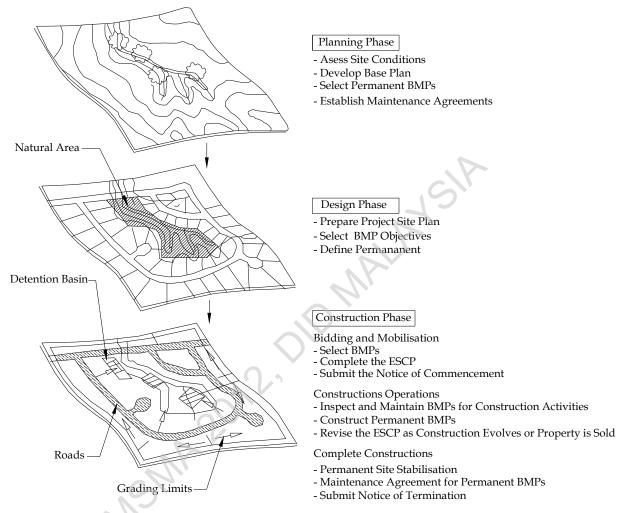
Plan Preparation Stages for ESCP (CDM, 1993)
